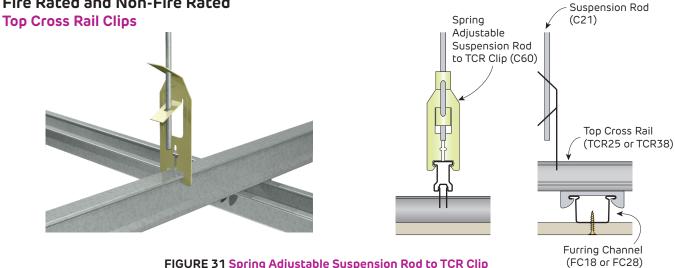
Spring Adjustable Suspension Rod to TCR Clip Perspective and Sections
